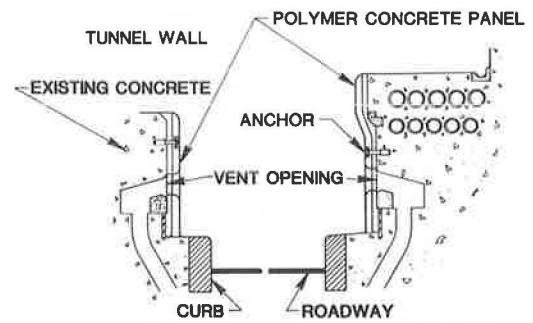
Schematic of precast panels in place at Sumner Tunnel.
